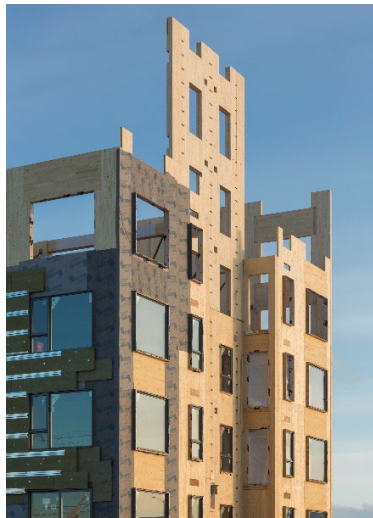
Origine residential building, Québec City (courtesy of Stephane Groleau).
